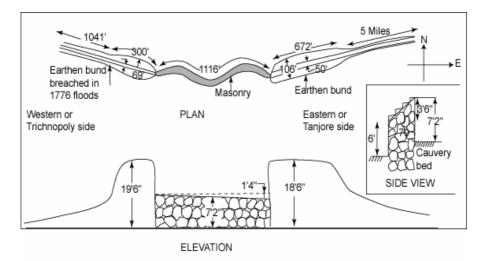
Plan and elevation of the Kallanai based on the 1777 report (not to scale)
